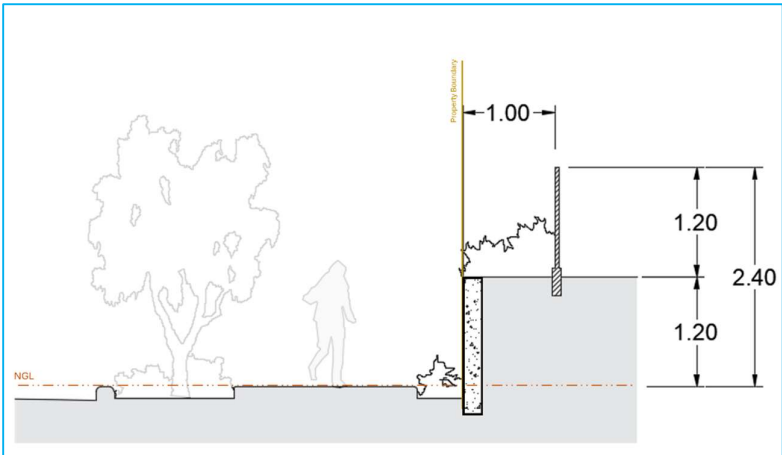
(di) Retaining wall and fence height - one step
